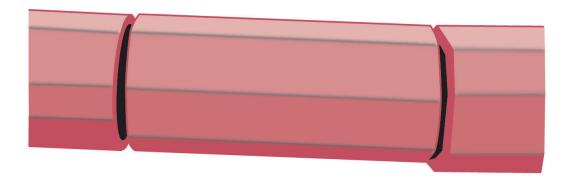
Clay tile pipe for subsoil drainage. (Skilled Trades BC, 2021) Used with permission.
